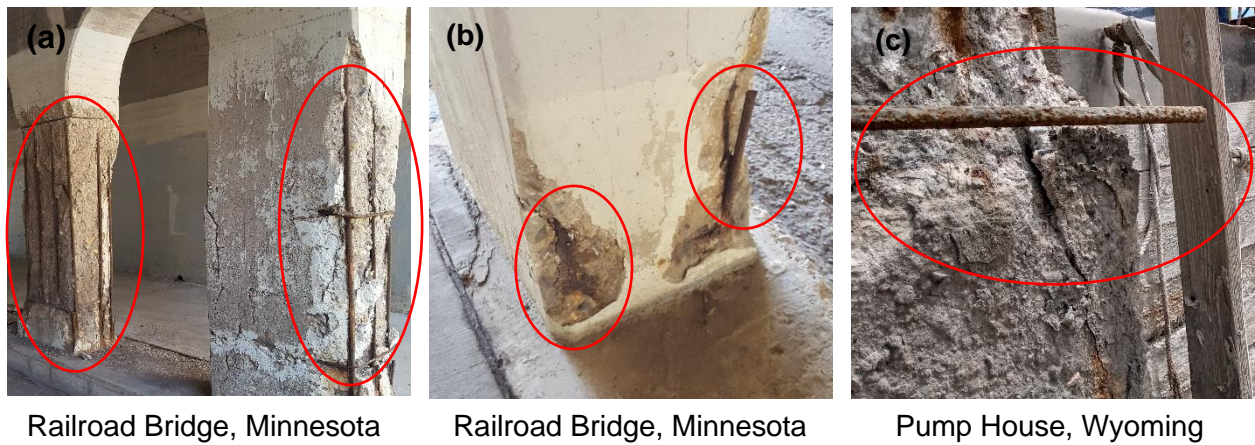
Examples of corroded reinforced concrete structures in the U.S. Midwest region: (a,b) corroded rebars, excessive delamination, and spalling in the RC columns of a railroad bridge, and (c) delamination, spalling and corroded rebar in a pump house in a powerhouse.
